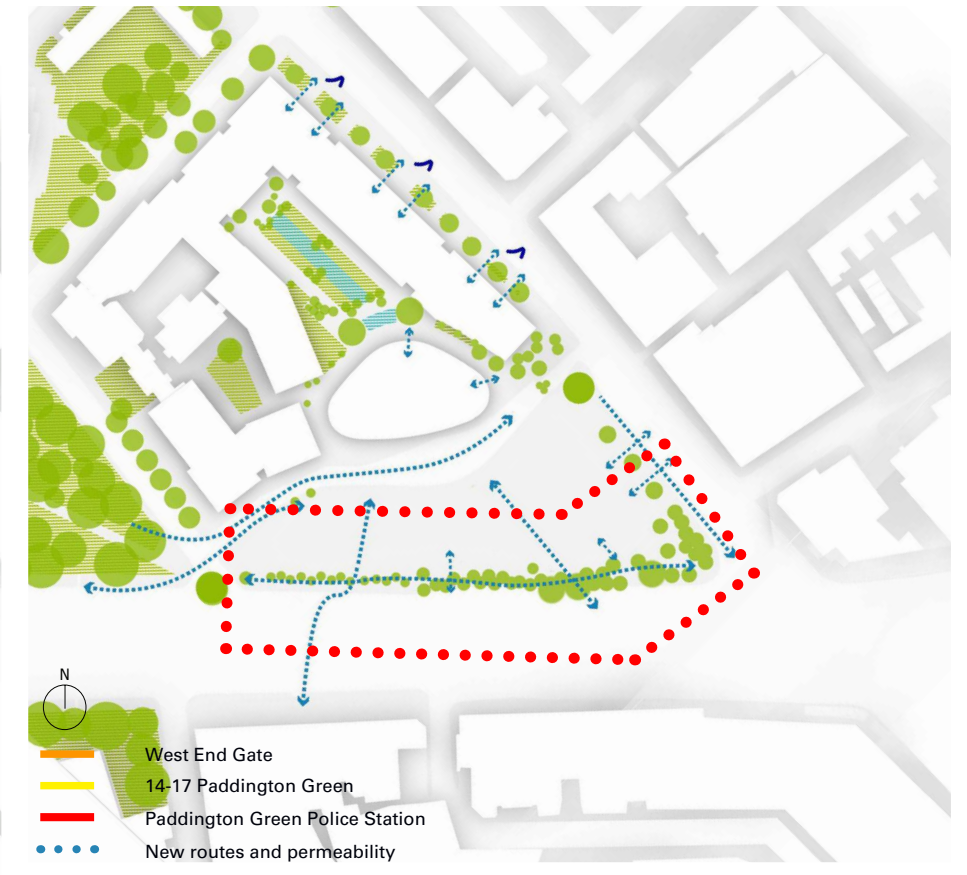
Harrow Road - Landscape and Site Permeability
